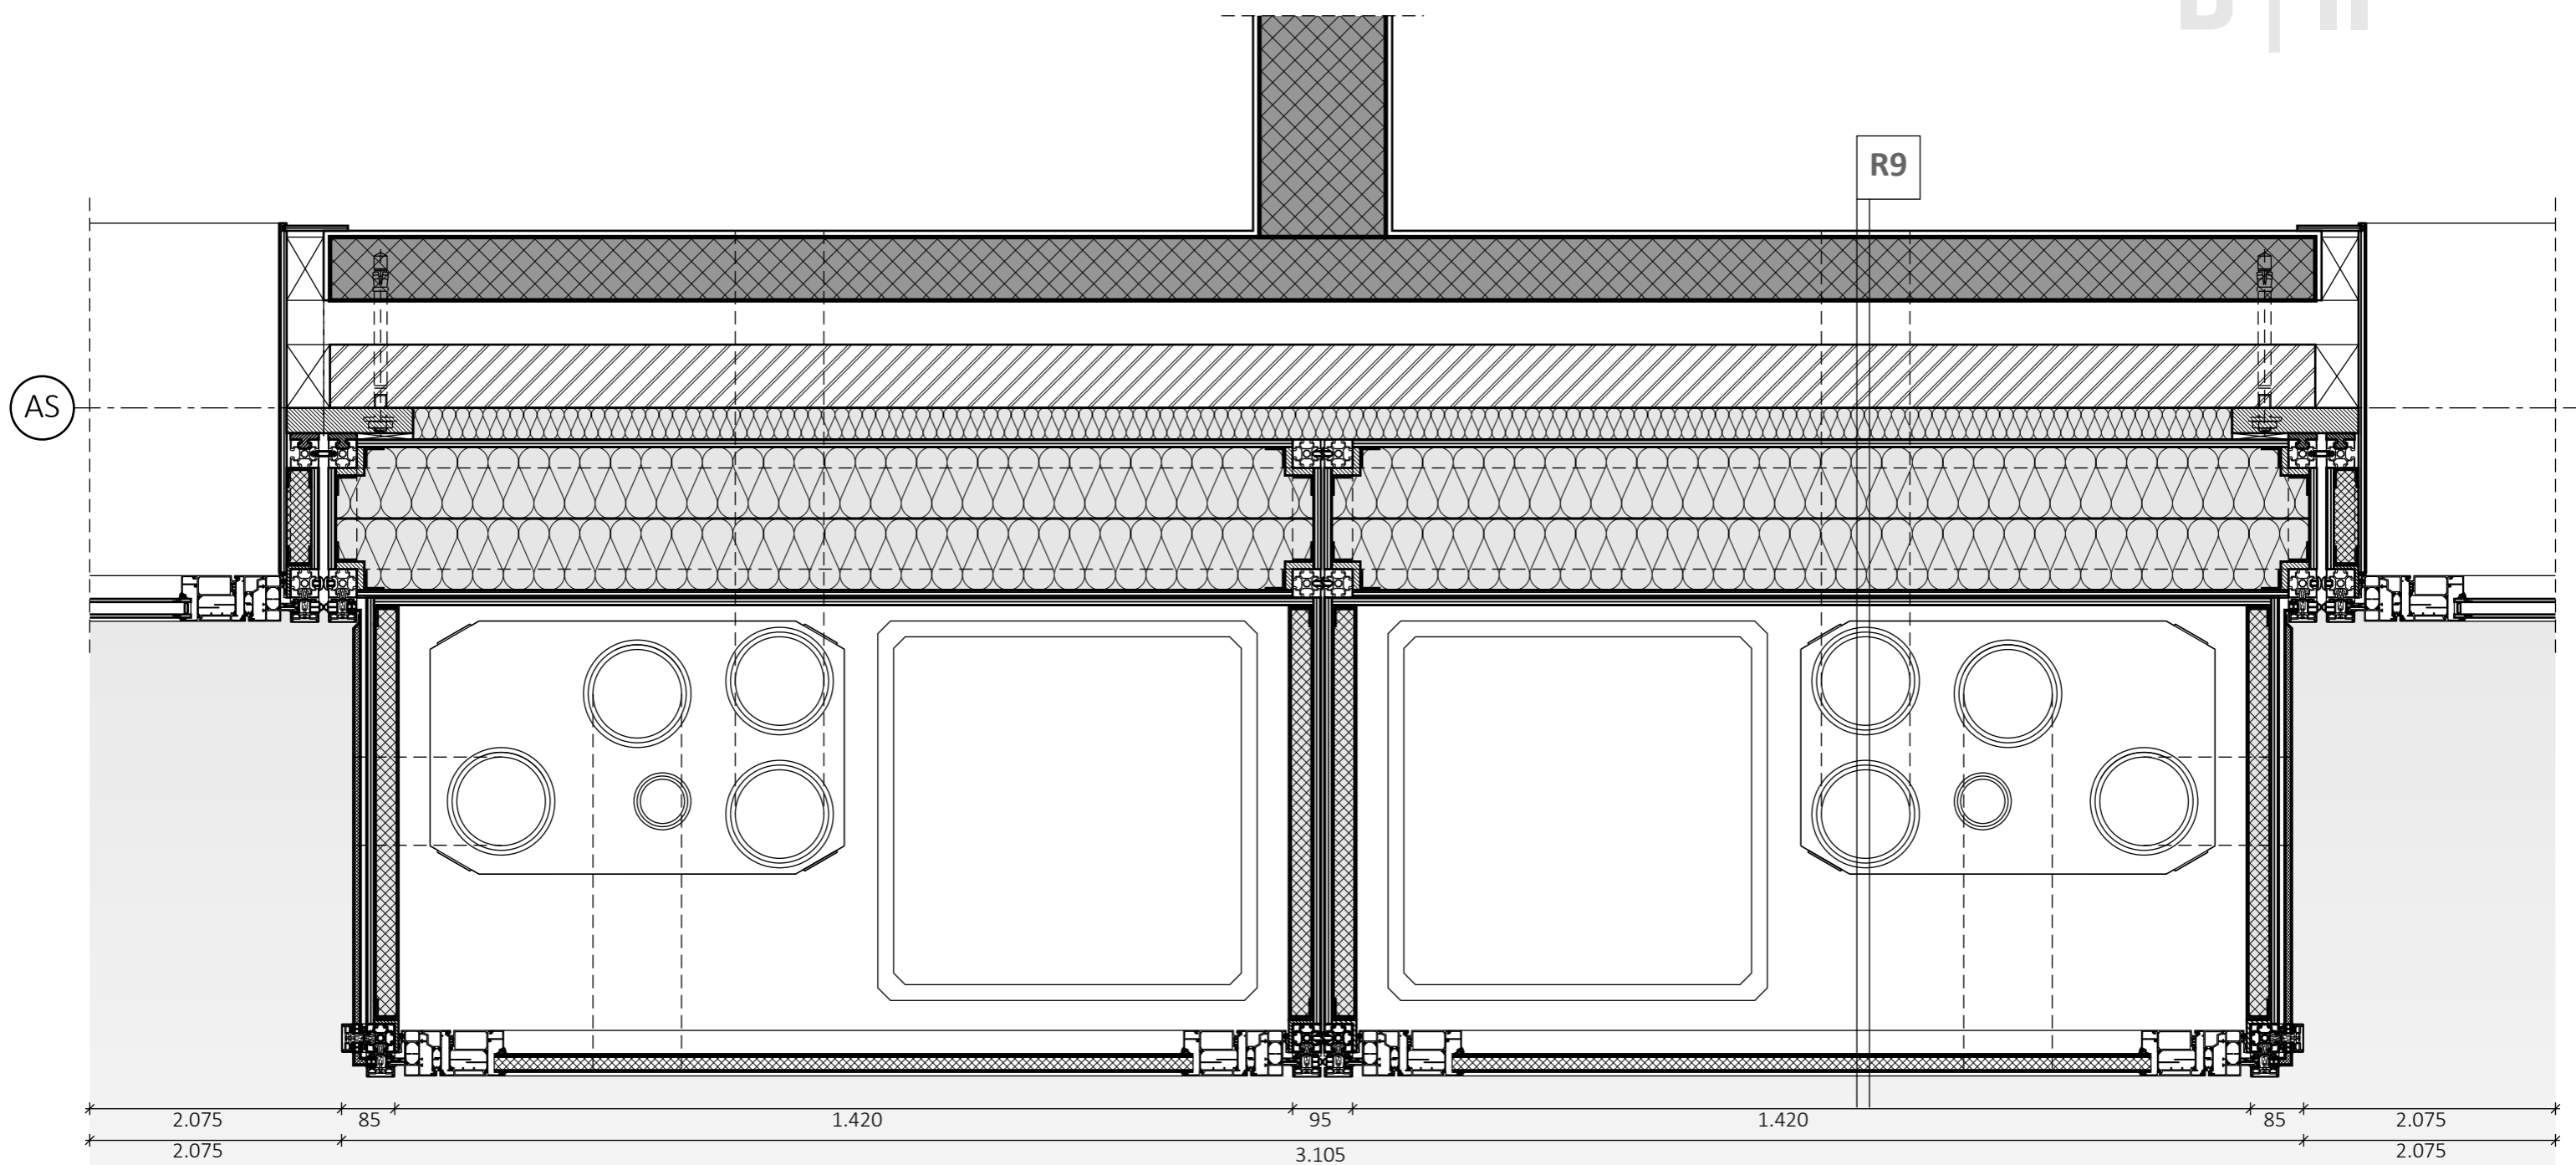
Detail | 1:5 | Horizontal | Corner Connection
